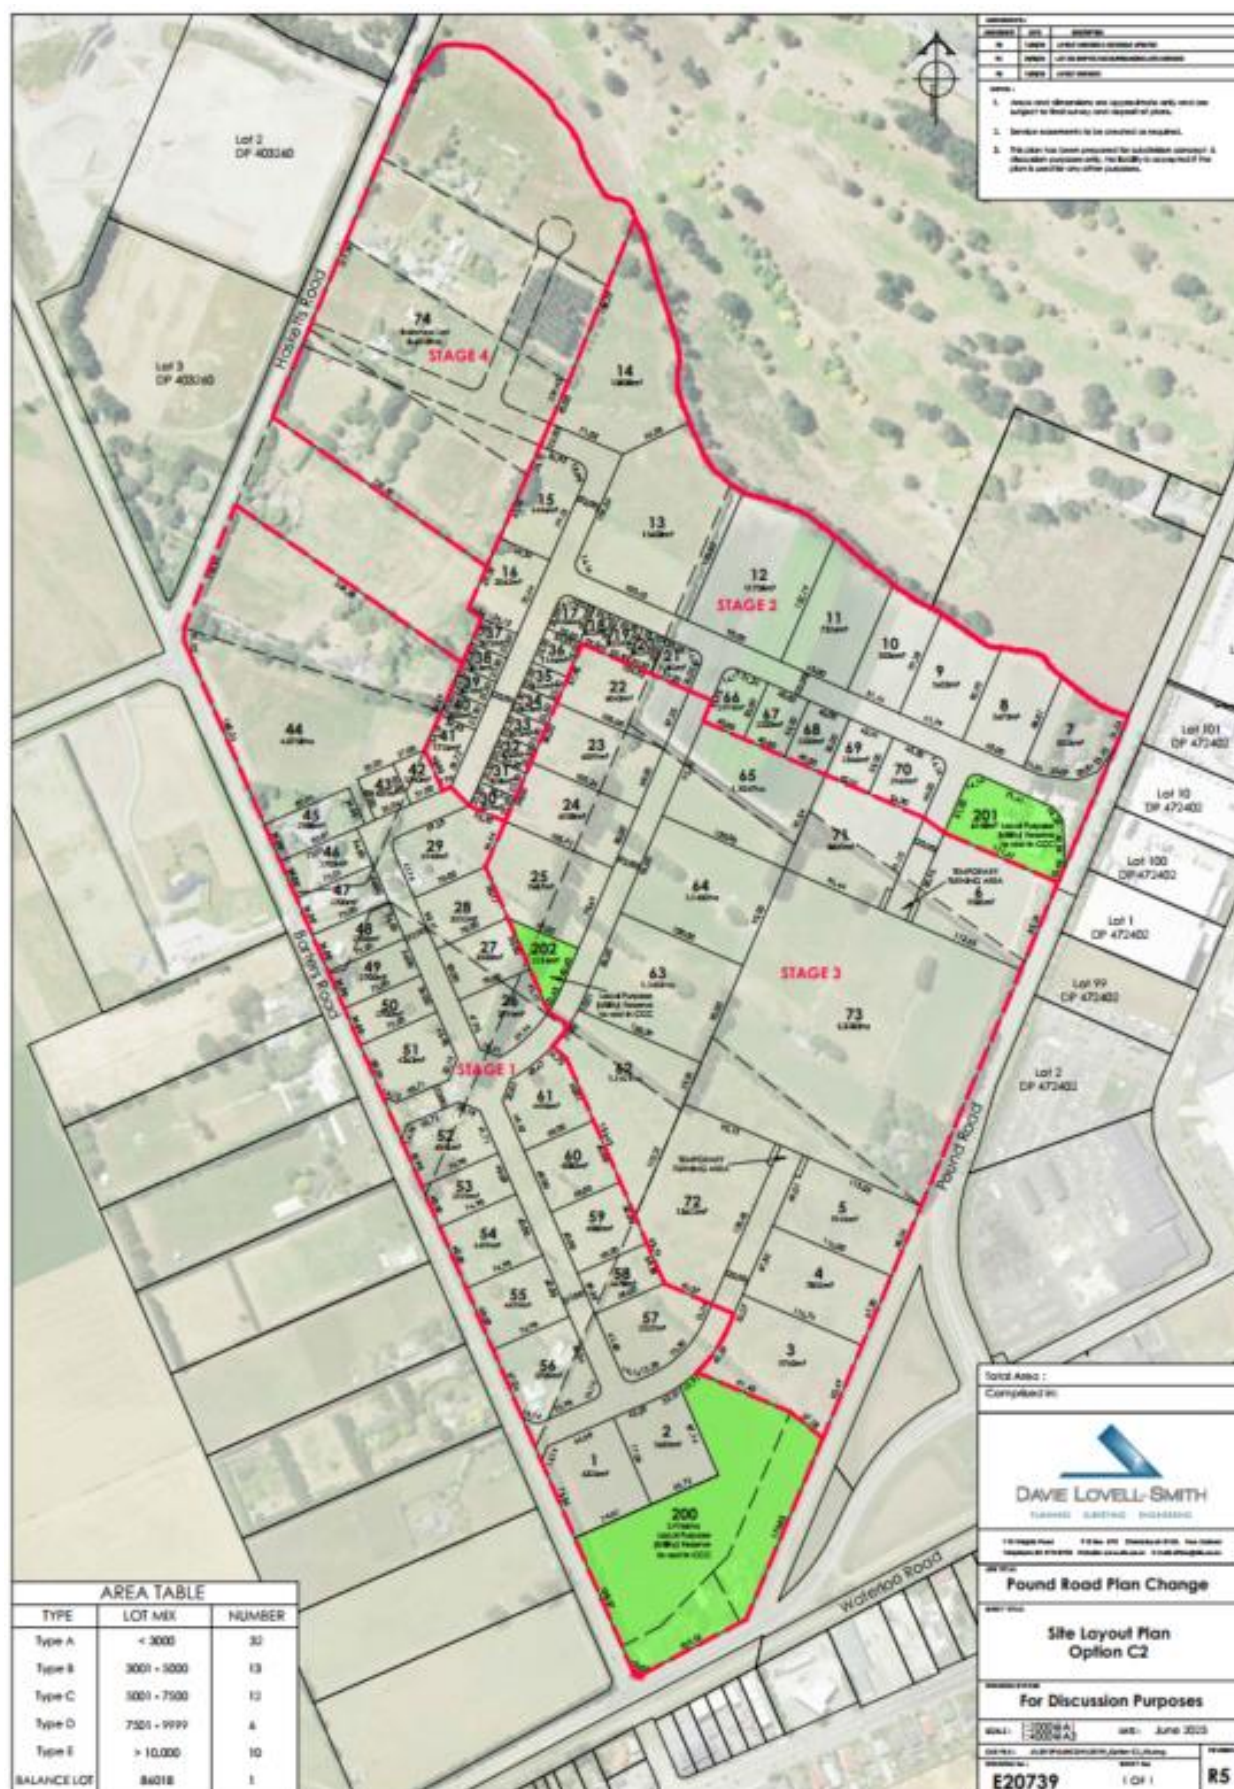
Proposed industrial development plan for Pound Road, Templeton, Christchurch. Figure provided by Dave Lovell-Smith, 2025
